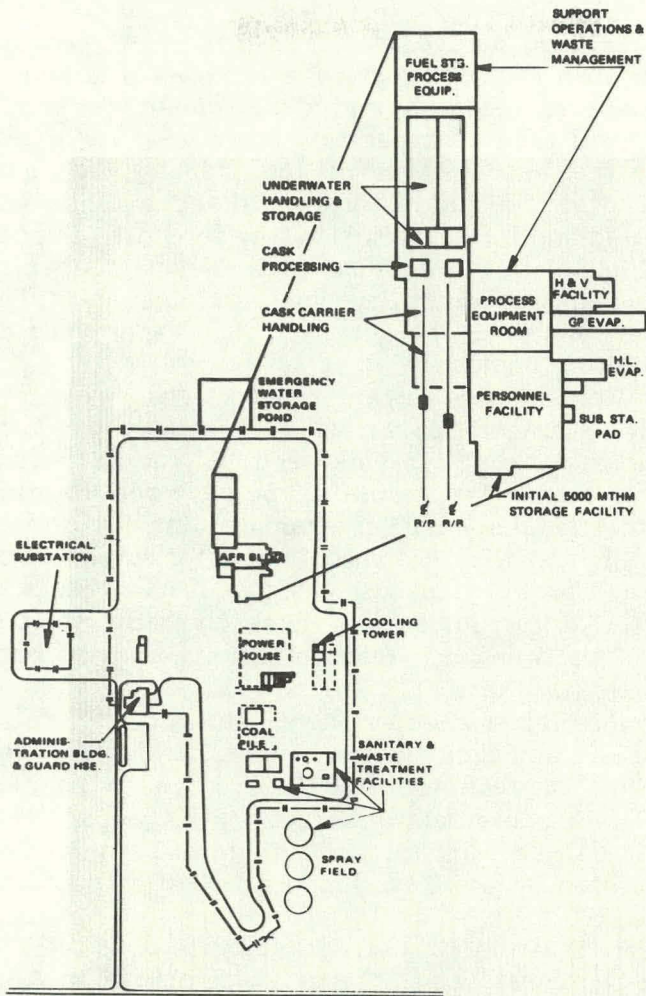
Conceptual Layout of a New AFR Storage Facility¹⁵
